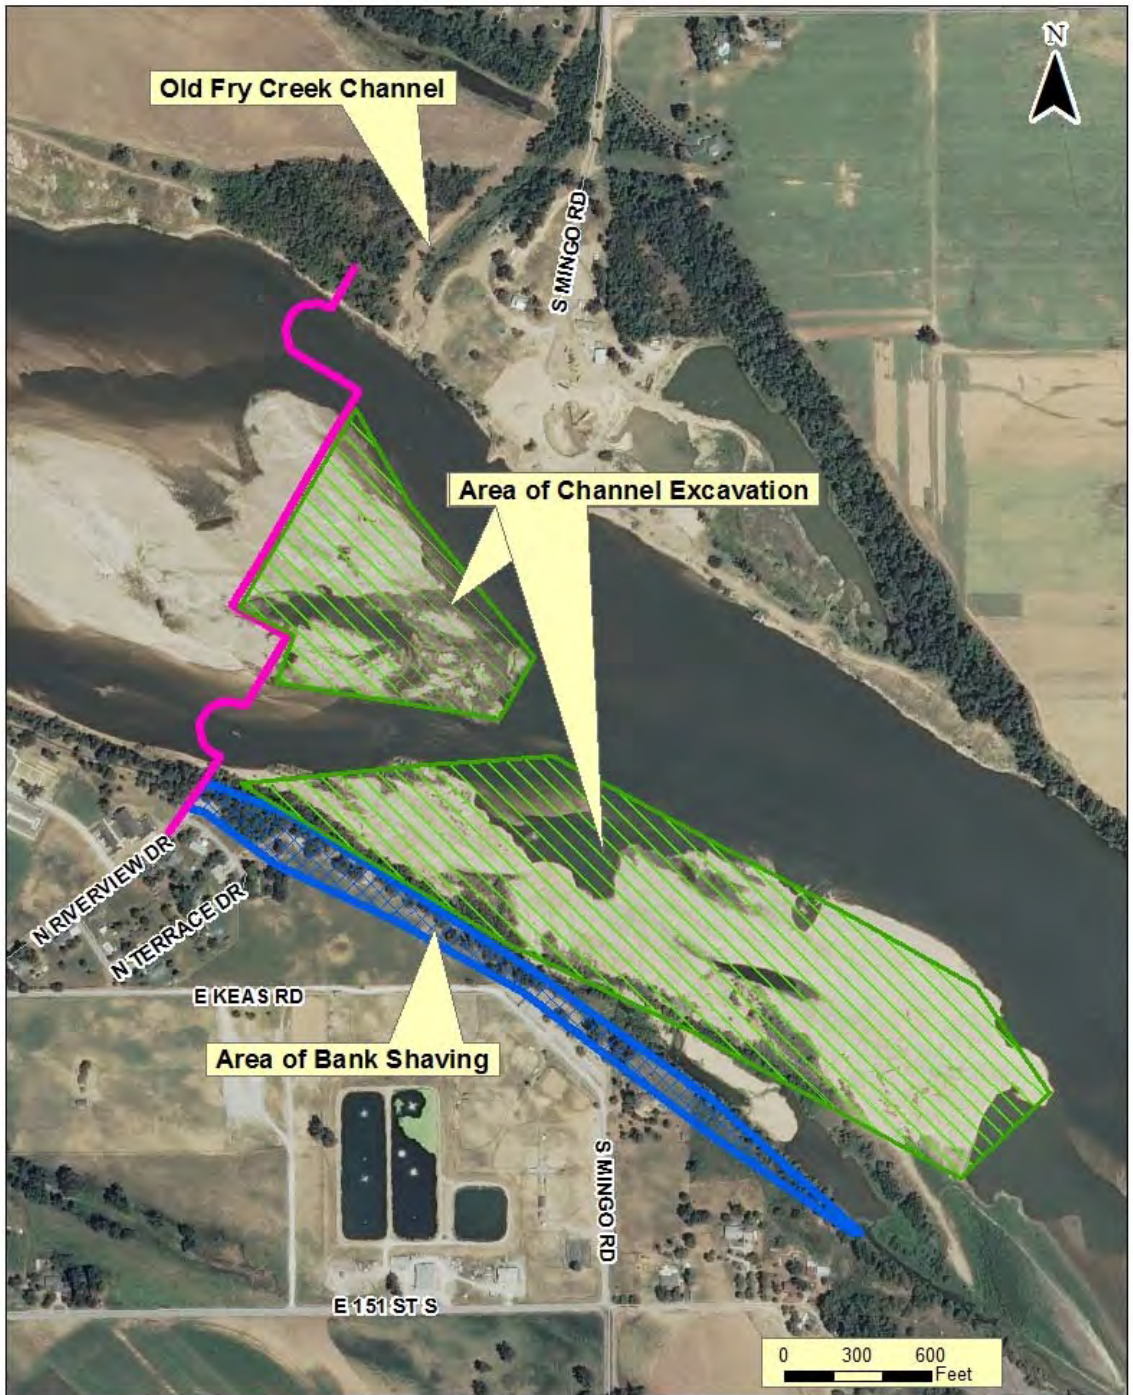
BIXBY LOW WATER DAM CHANNEL EXCAVATION AND BANK SHAVING
